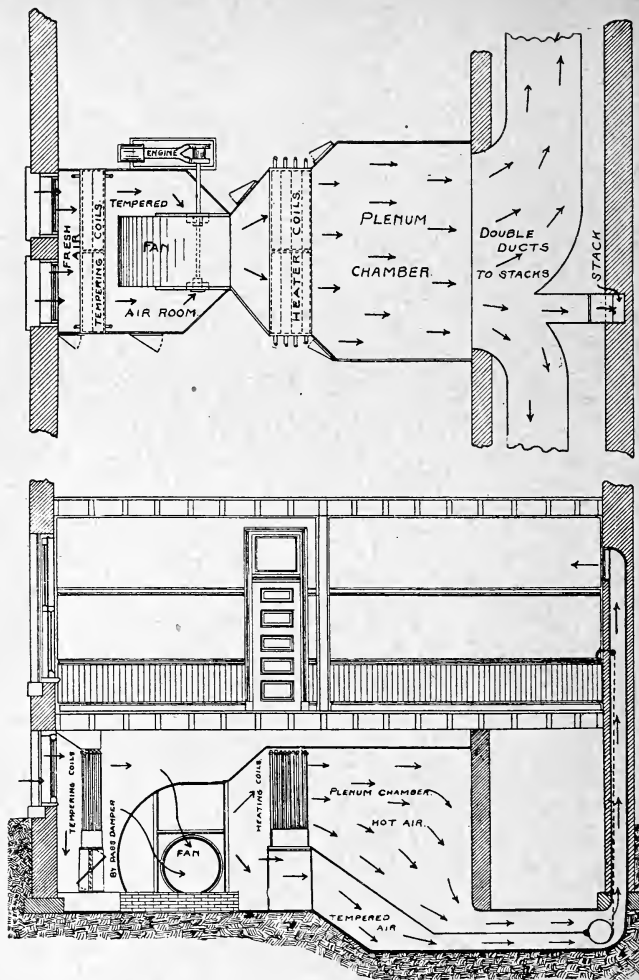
Fan Room Layout with Double Underground Ducts and Mixing Dampers at Base of Room Stacks.
